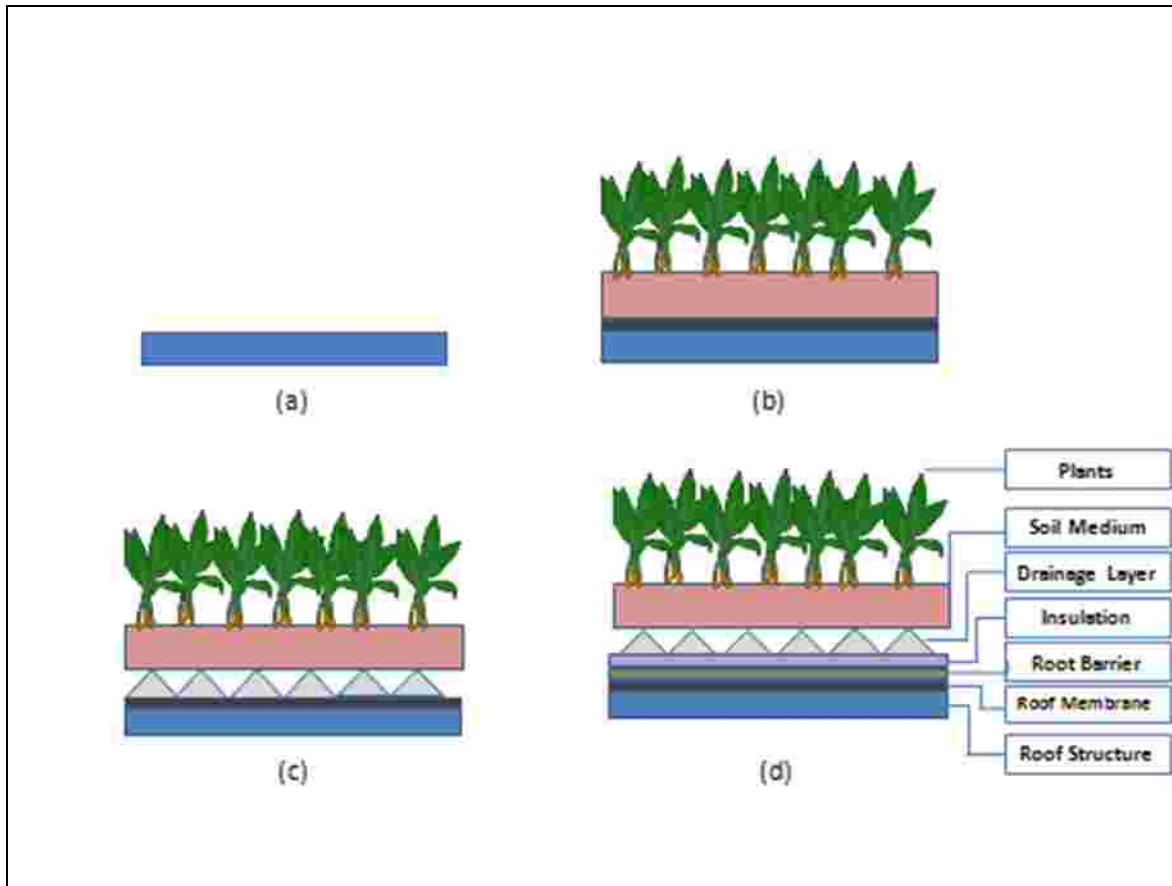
The four treatments in the Green Roof design- a) Control (roof structure only), b)Vegetation, soil medium and roof shelter, c) Vegetation, soil medium, drainage layer, roof structure, d) Commercial green roof (vegetation, soil medium, drainage layer, insulation, root barrier, roofing membrane, and roof structure).
